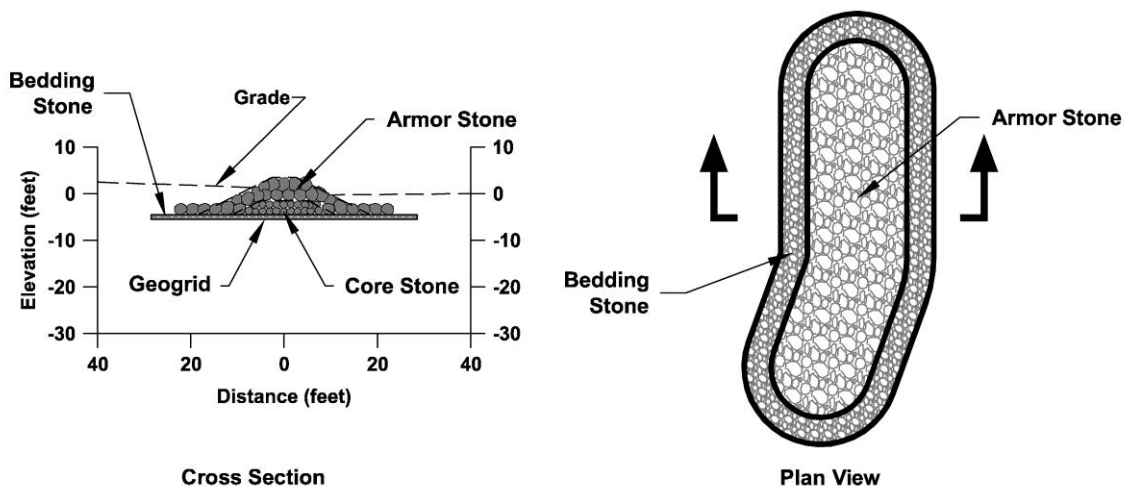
Alternative 3 - Typical cross-section and plan view of the proposed terminal groin
